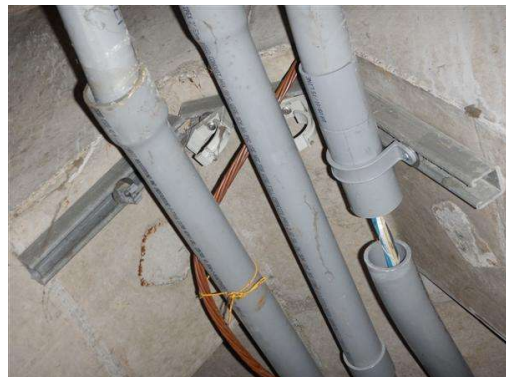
Separated electrical conduit with exposed wires at Pier 29NB
